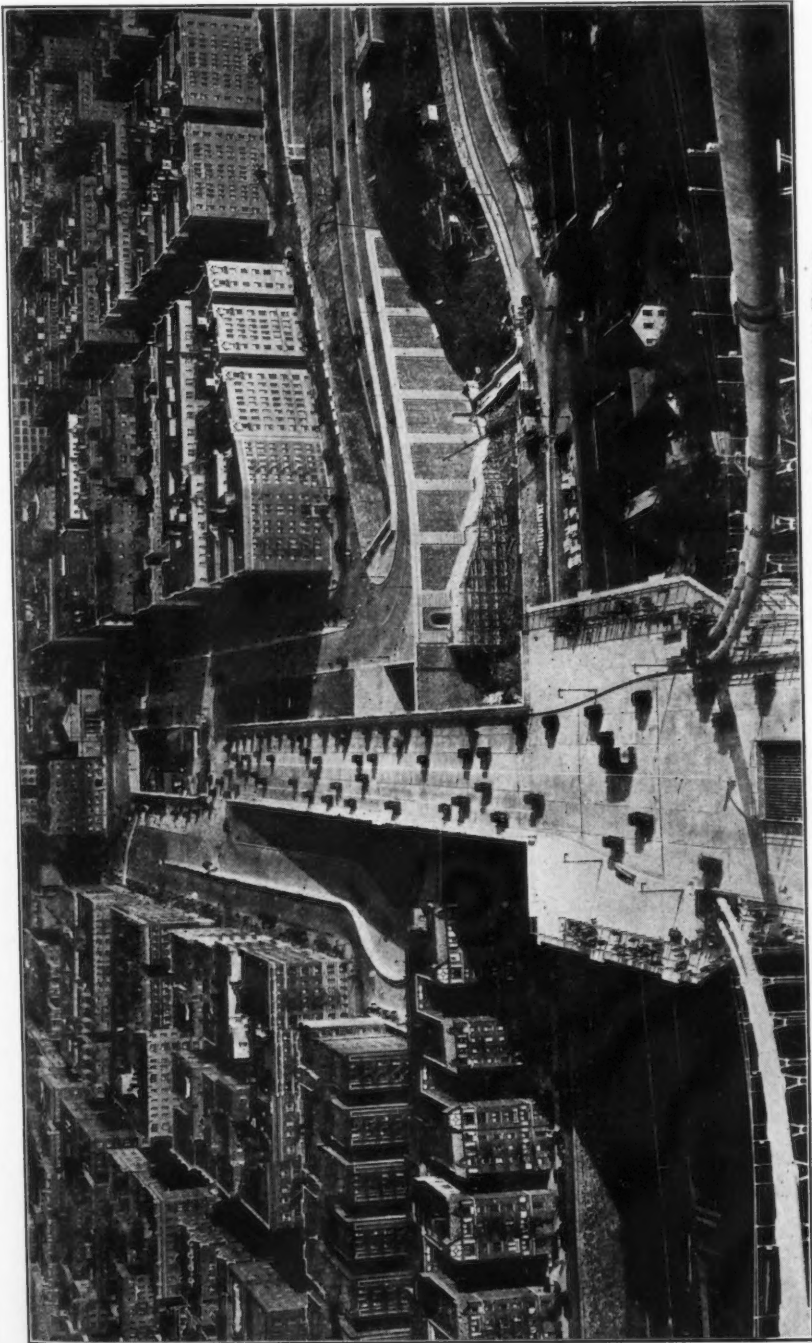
VIEW OF TRAFFIC OPERATION ON NEW YORK APPROACH, LOOKING EAST FROM TOWER.
